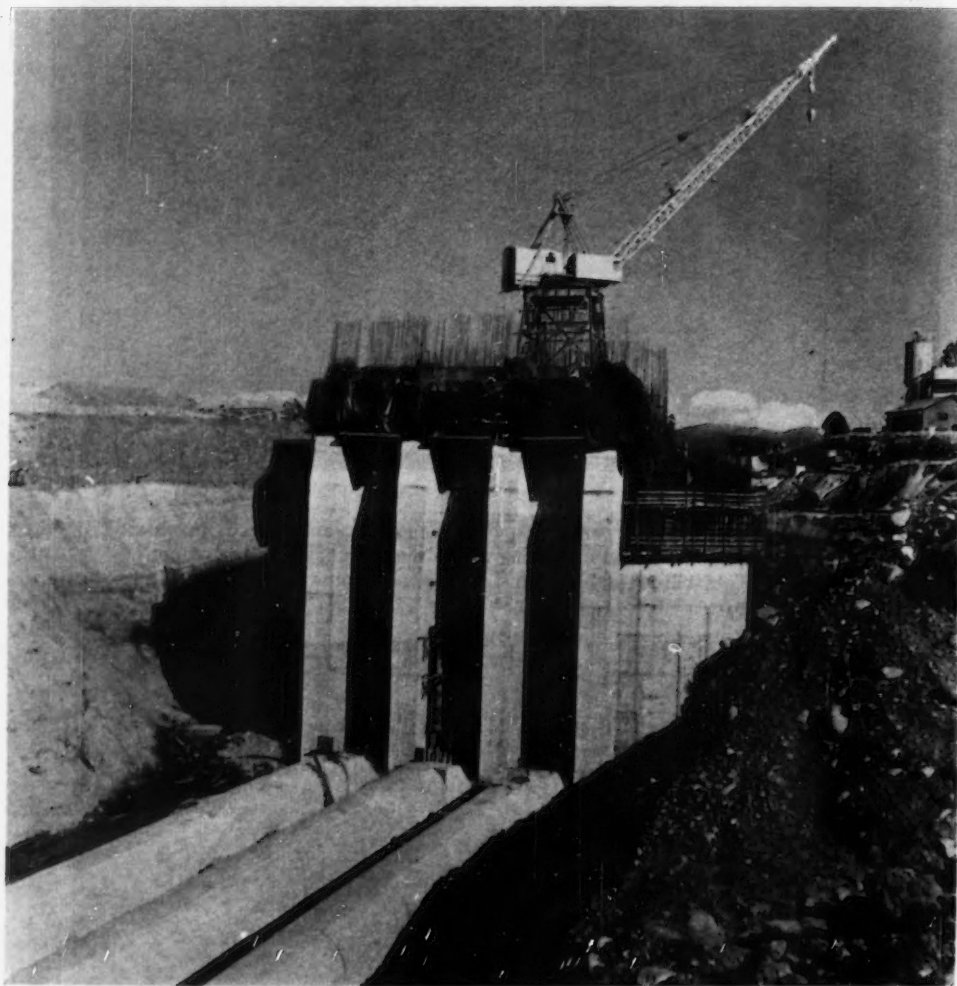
The "whirley" crane transferred concrete buckets from truck to forms in all parts of the plant building.
